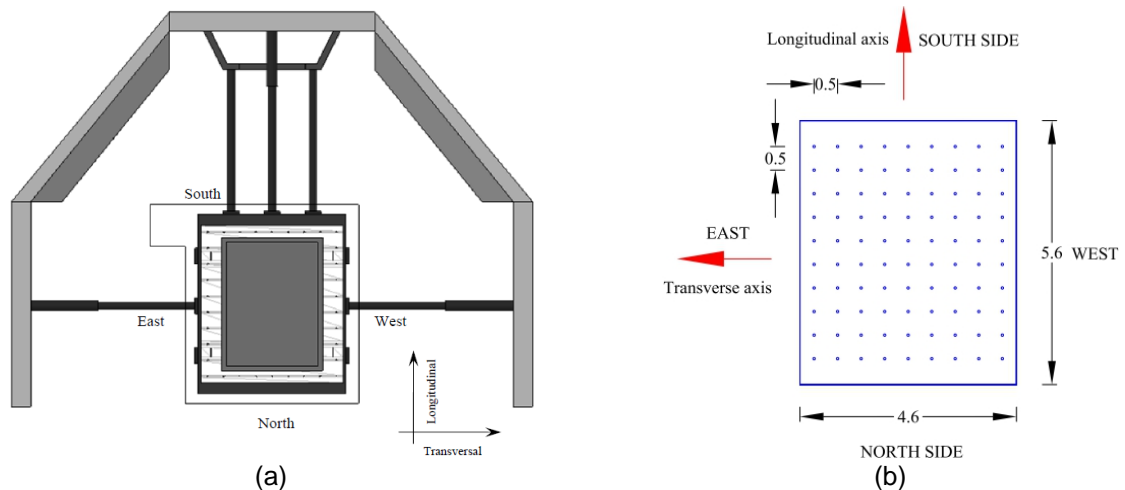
LNEC's shaking table: (a) schematic plan view (Mendes, 2012); (b) dimensions of the foundation slab (units in m)
